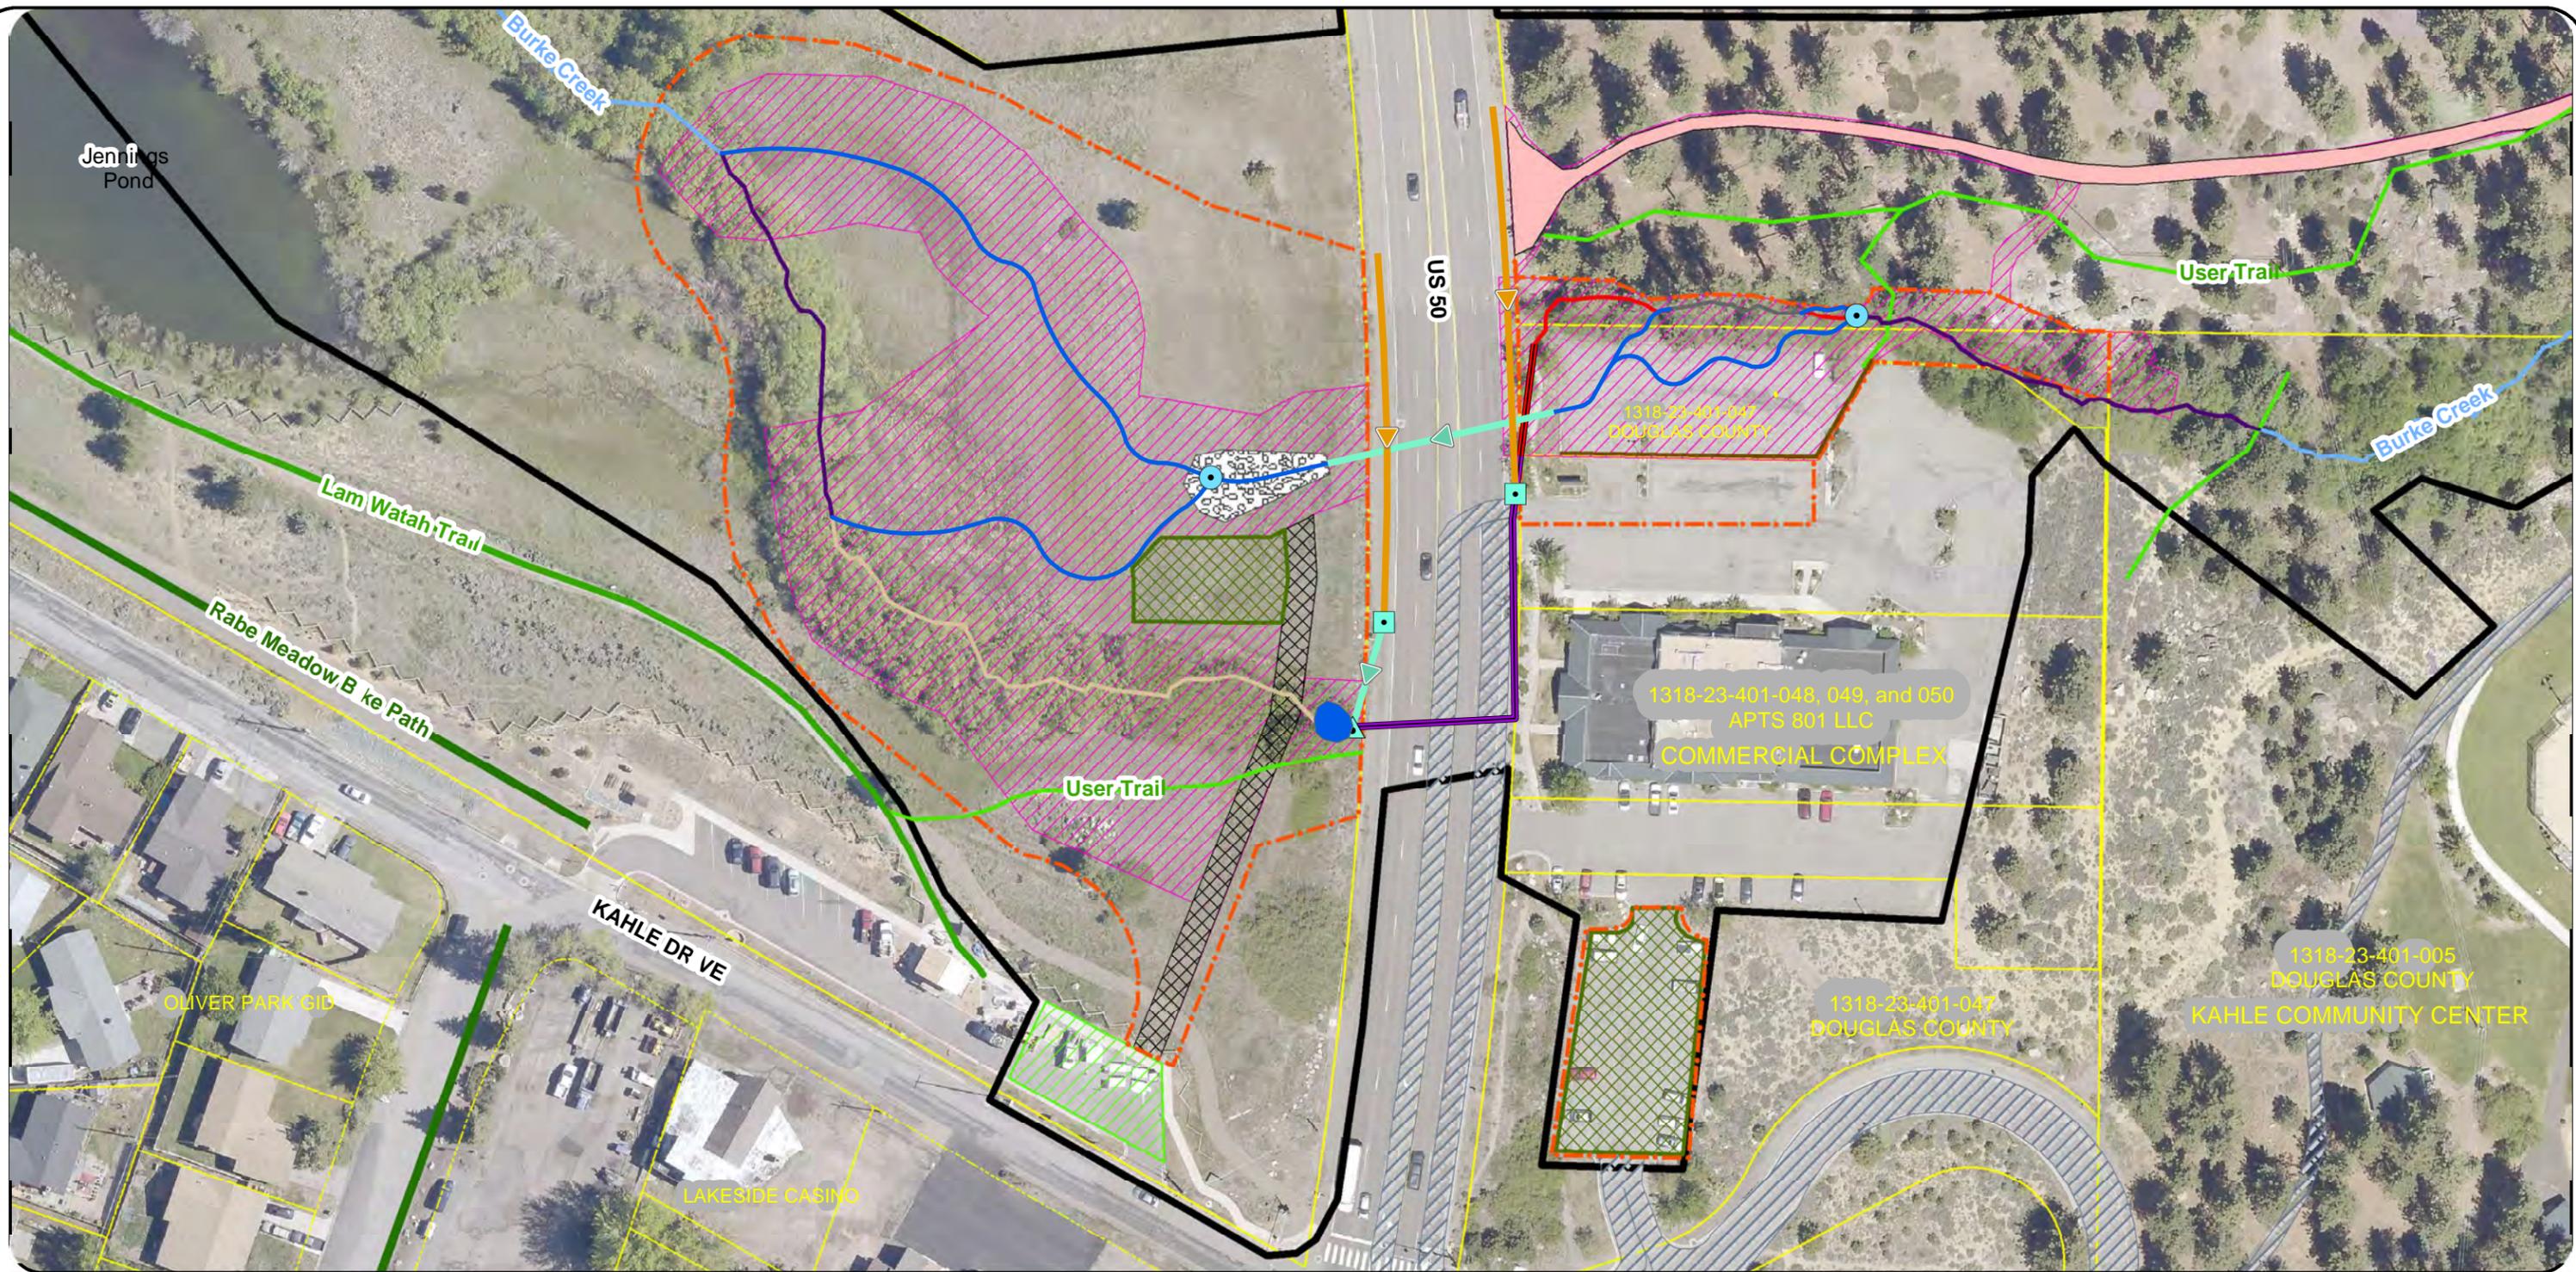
PROPOSED ACTION - NORTH DETAIL
